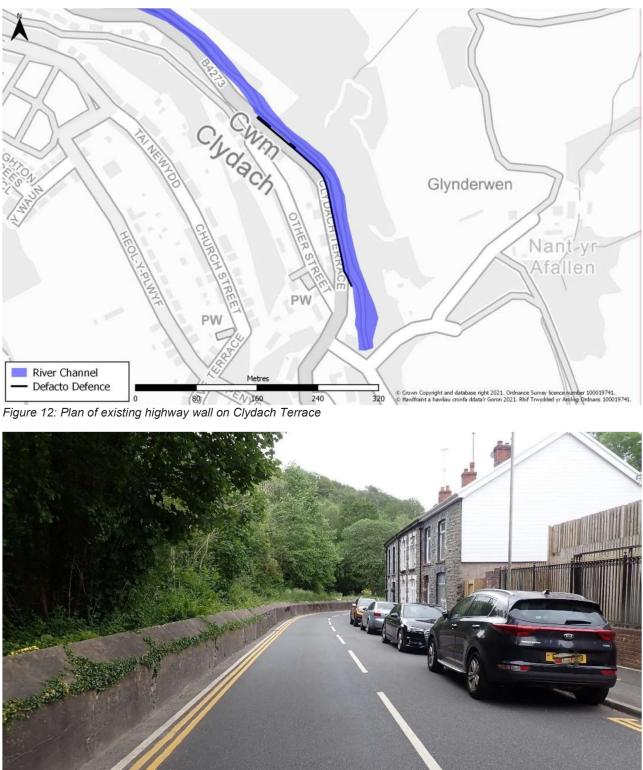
Highway wall on Clydach Terrace (looking downstream)
